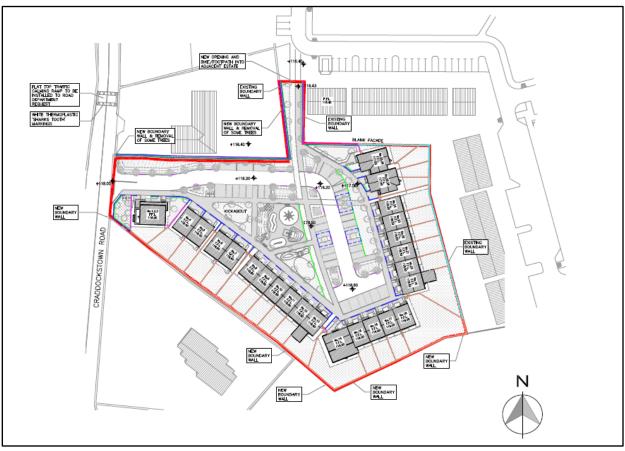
Site Layout (Source: Hayes Higgins Partnership)
